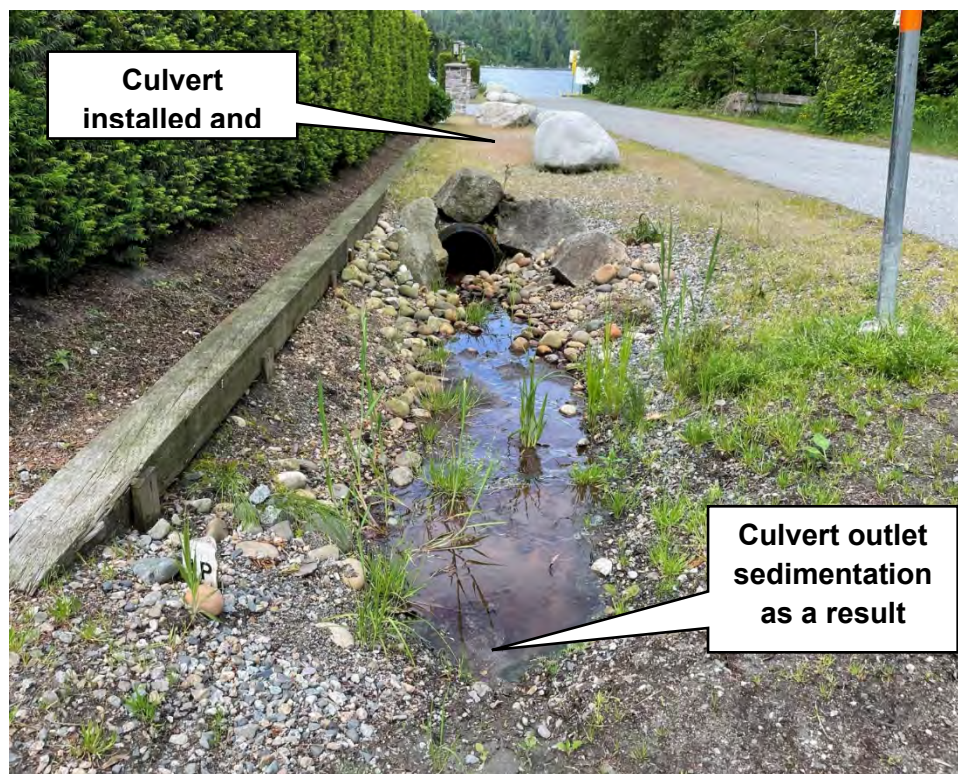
INFILLED AND LANDSCAPED DITCH/SWALE RESULTING IN SEDIMENTATION AT CULVERT OUTLET
